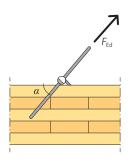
Principle for fixing a spherical head lifting anchor.
